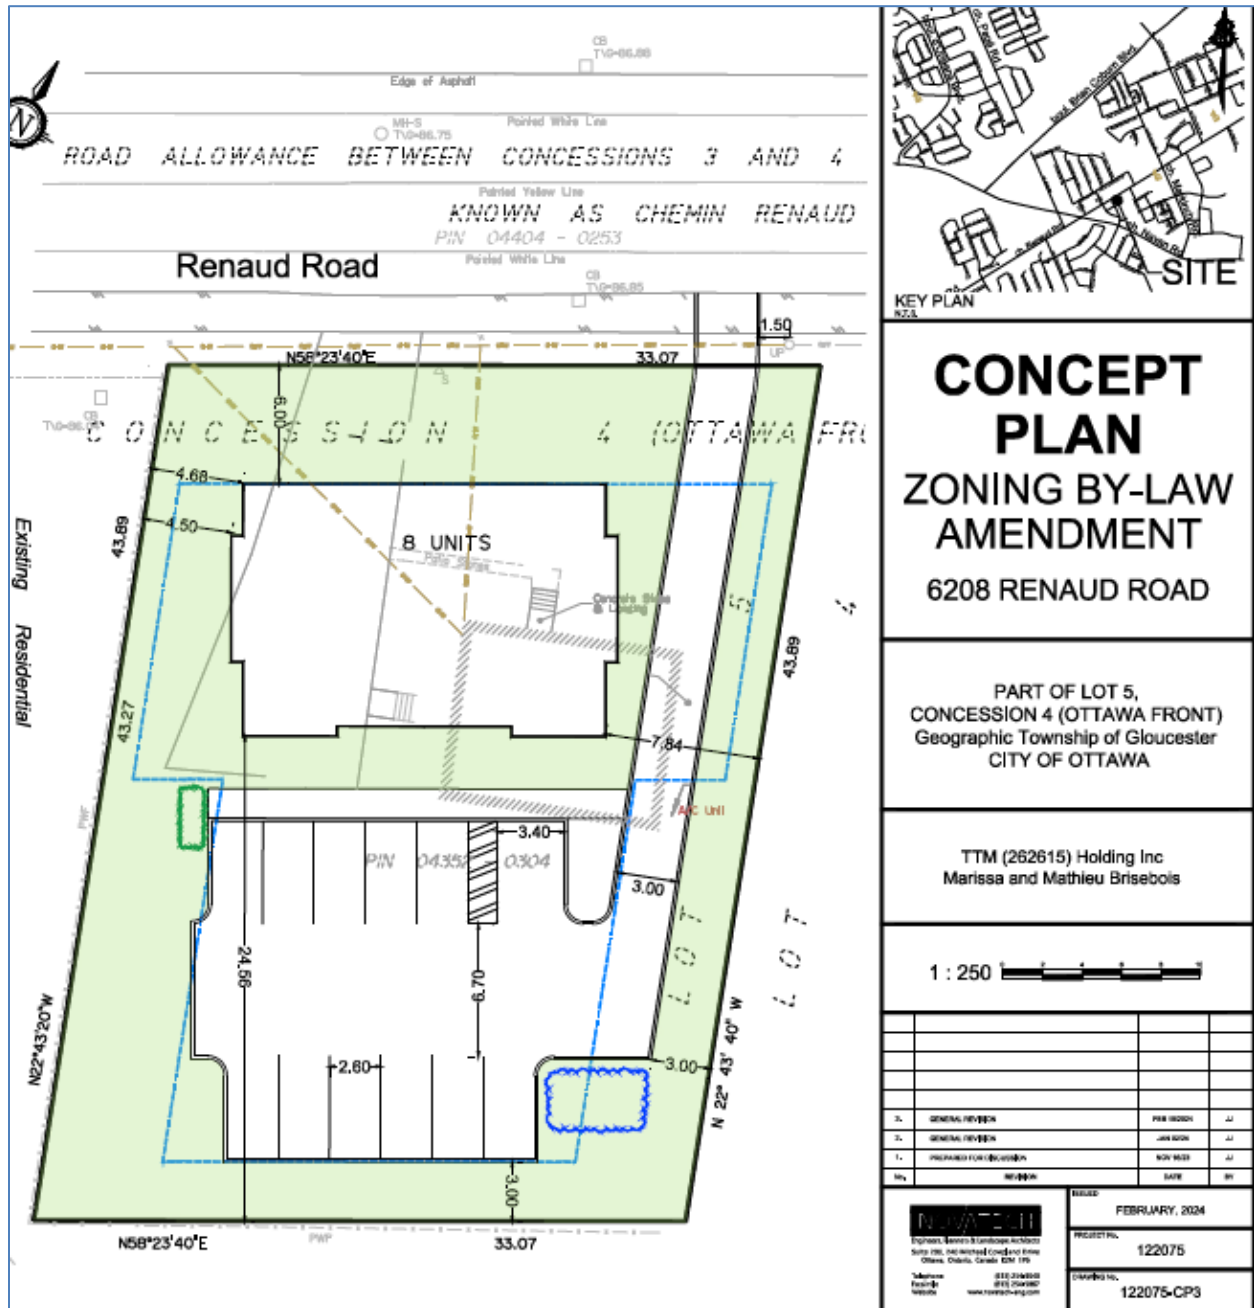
Capture of Concept Plan showing a low-rise apartment building.
